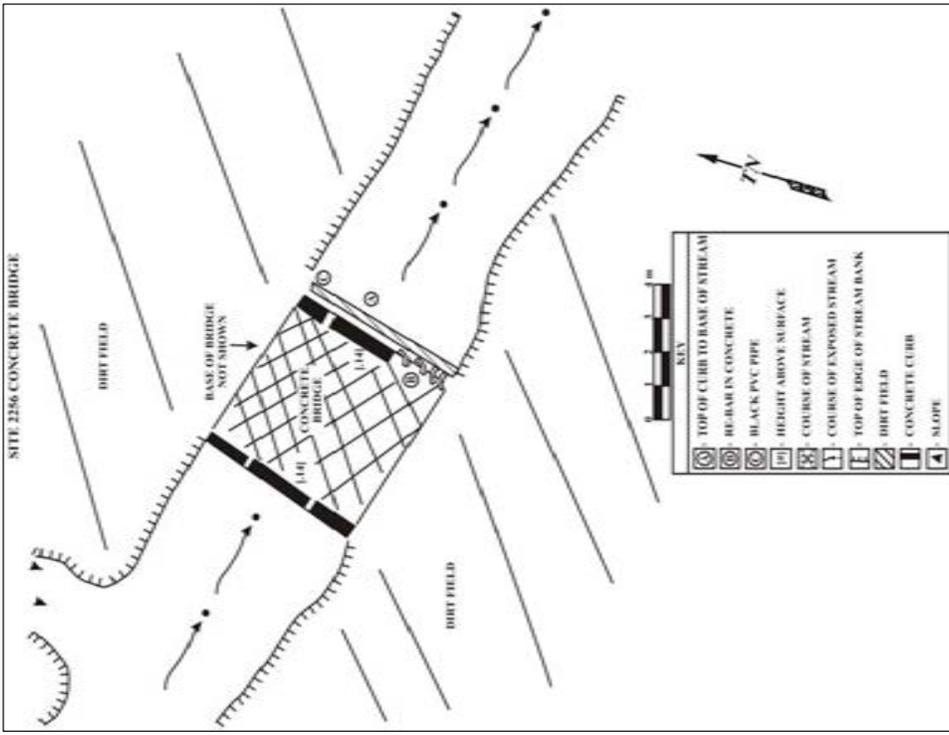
Planview of Site -2256 Bridge Concrete Deck and Floor.
